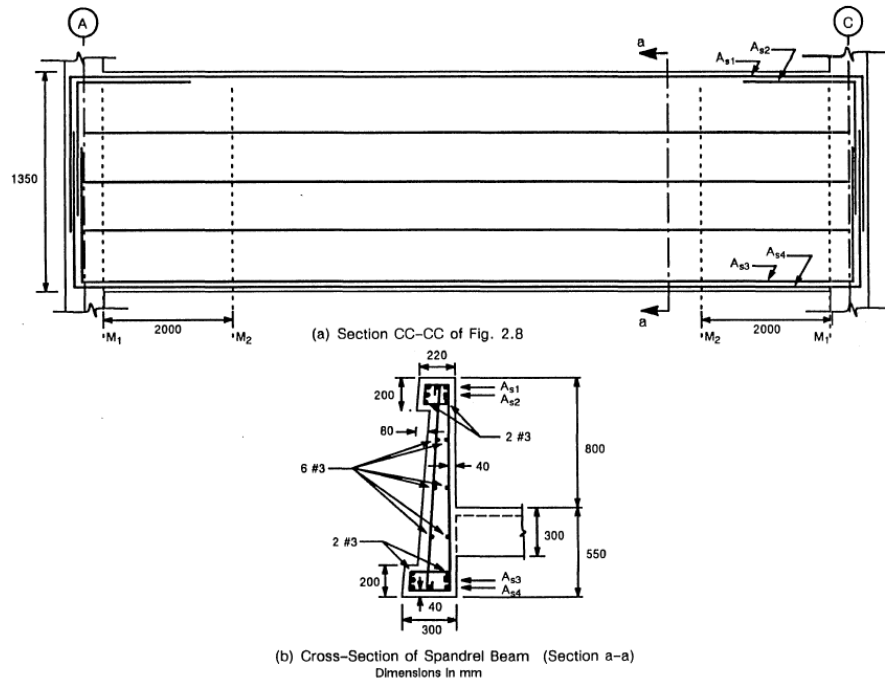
Details of spandrel beam (Downs, et al., 1991)
